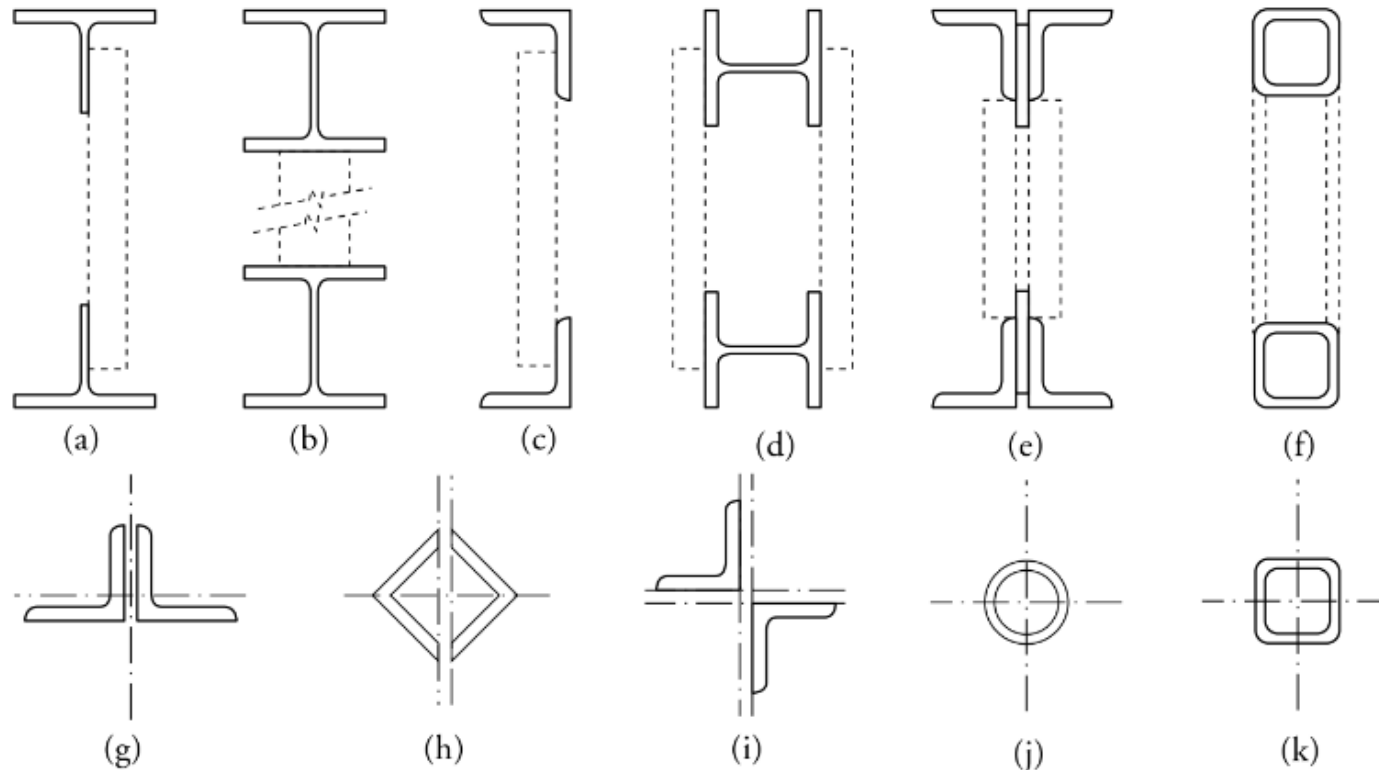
Typical sections for truss members: (a) to (f) commonly used in welded construction (though (a), (c), (d) and (e) may be bolted), and; (g) to (k) common sections used for chord and web/diagonal members
